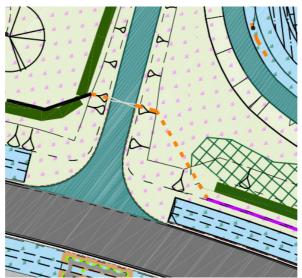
Access to rear of barrier provided at Pond 3 gated access track
